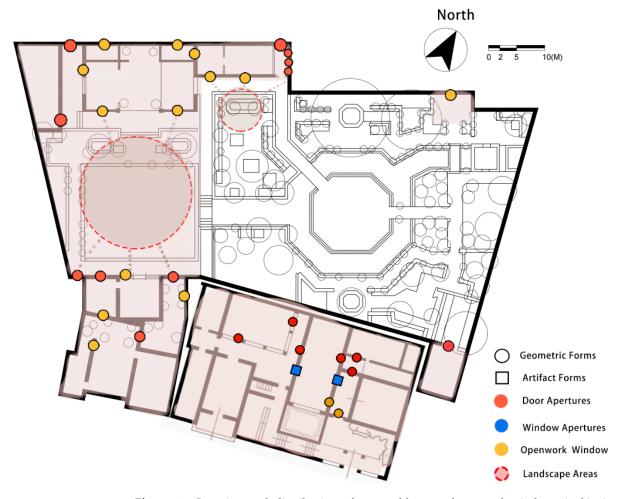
Location and distribution of permeable-type doors and windows in Yuyin Garden (source: authors).
